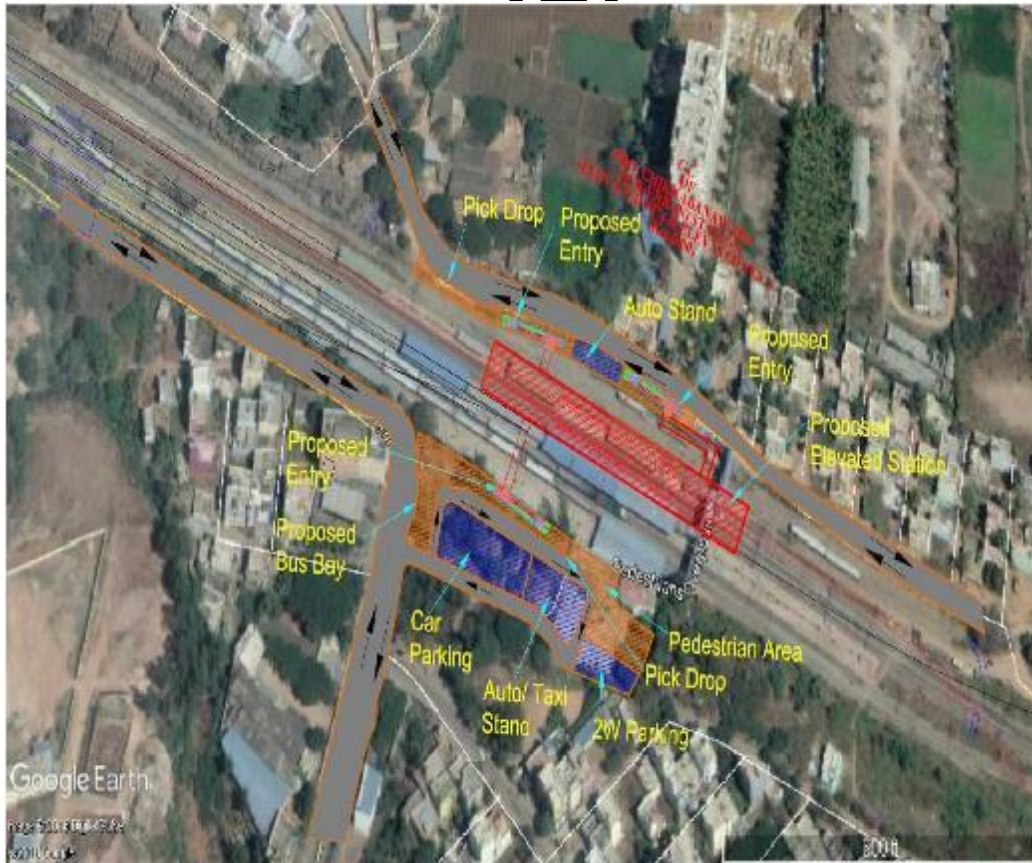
Conceptual Intermodal Integration Plan at Chikkabanavara Station
